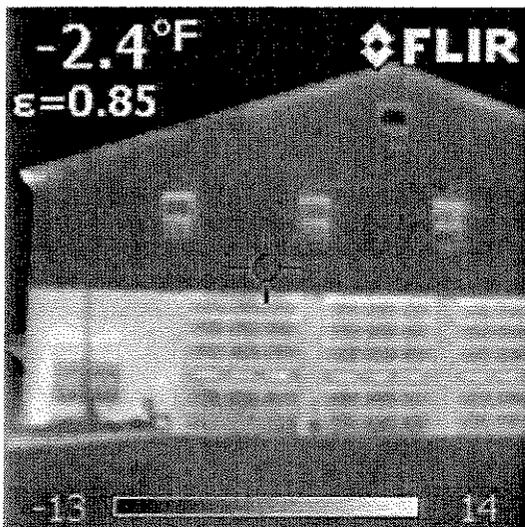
York Village Fire: Uninsulated block wall 1st floor, insulated frame wall second floor.
